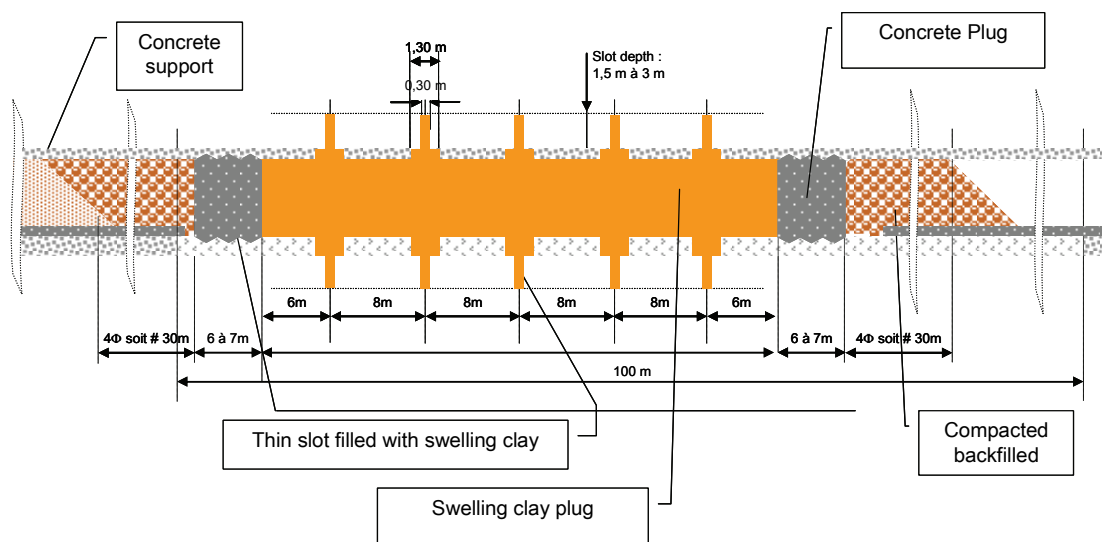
Opening and Filling a Trench with Bentonite Bricks
